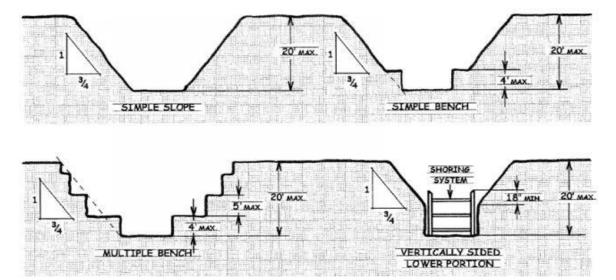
| Benching & Sloping For Excavations Made in Type "B" Soil
